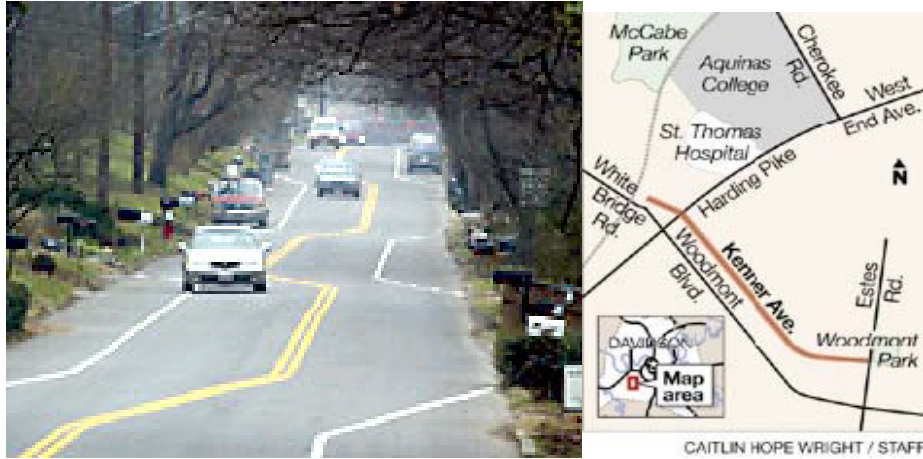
Use of pavement markings to create a chicane using lane shifts and alternating parking (source: Hamburg 2005)
